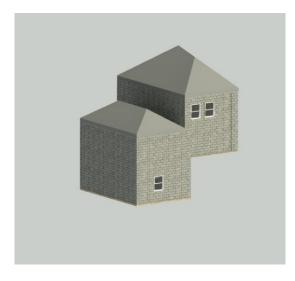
Beqiri, A. (2024) Lluke Zanati House 3D View
